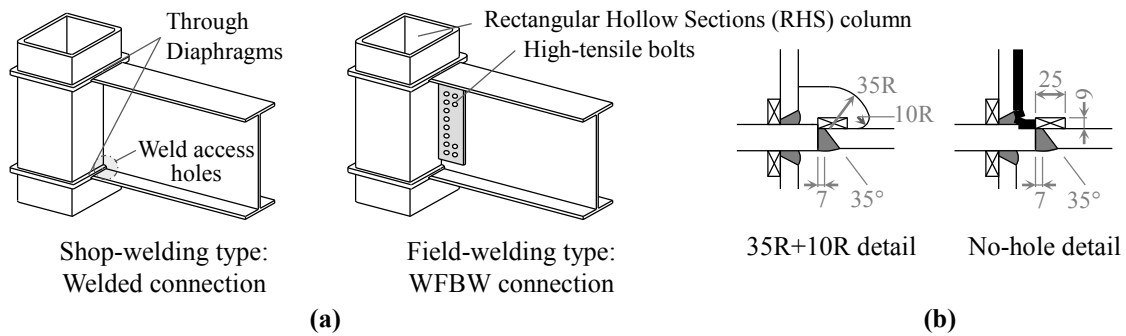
Japanese connection details: (a) beam-to-RHS column connection and (b) current weld access hole details.
